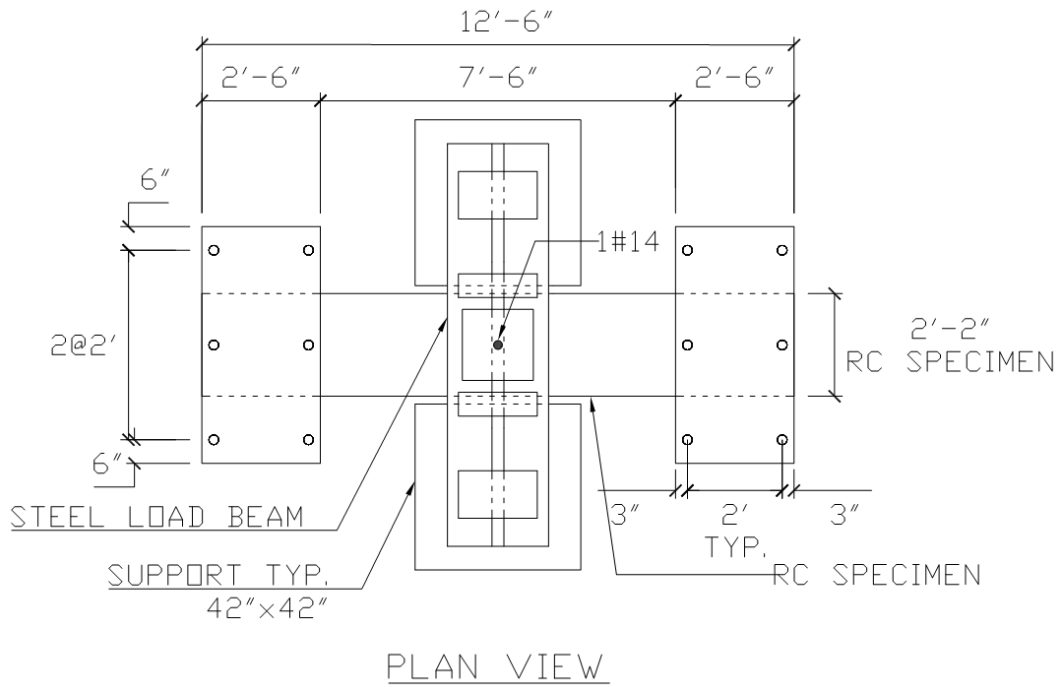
Plan view of test setup for specimens with one No. 14 headed bar
